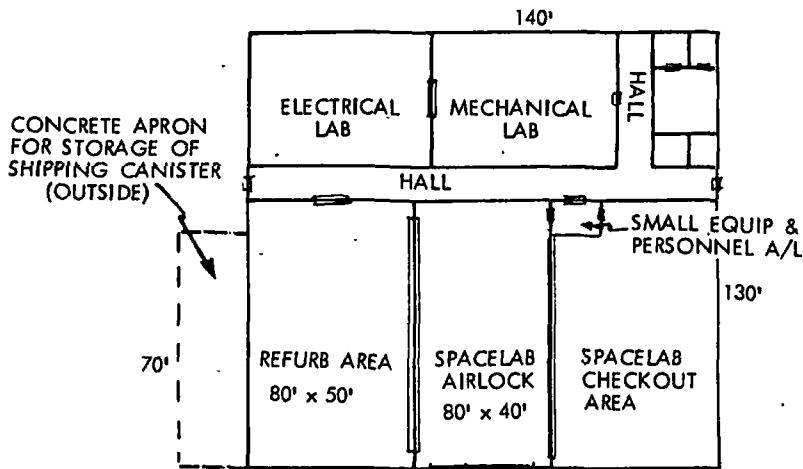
Installation, Checkout and Refurbishment Building
